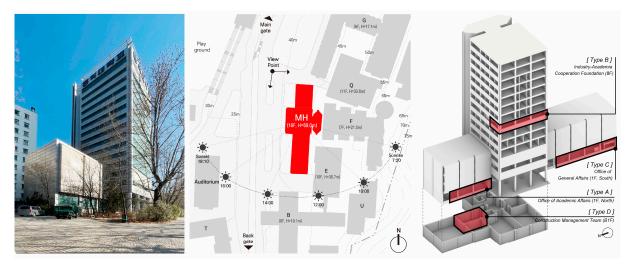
Site plan and photo of the target building (Seoul, Republic of Korea, 37°33′02.6″ N 126°55′33.5″ E).
